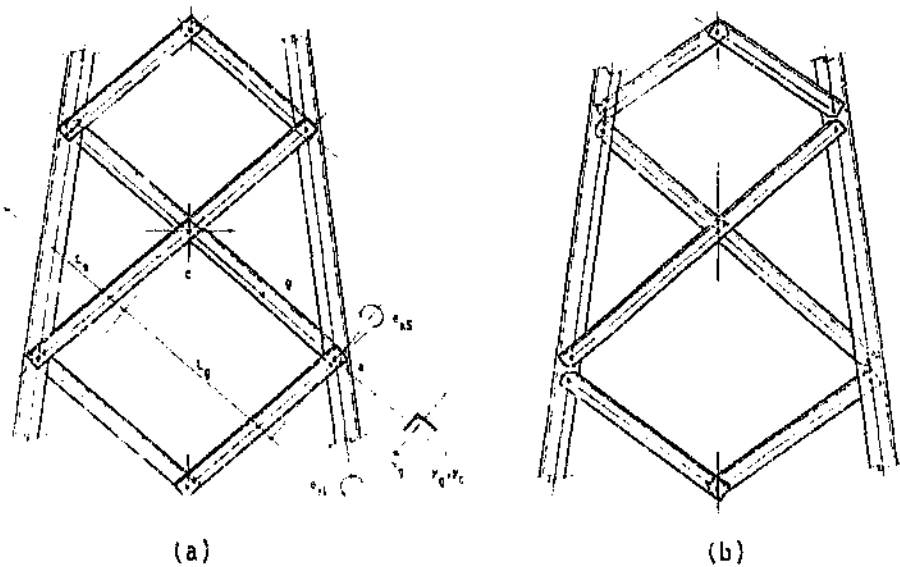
a) Bracing arrangement for Test 801 - Base case.
